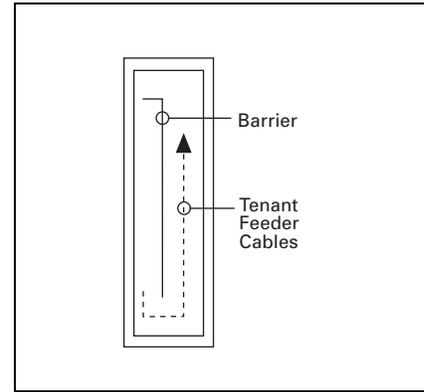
Rear Barriered Wireway Metering Section Side View
